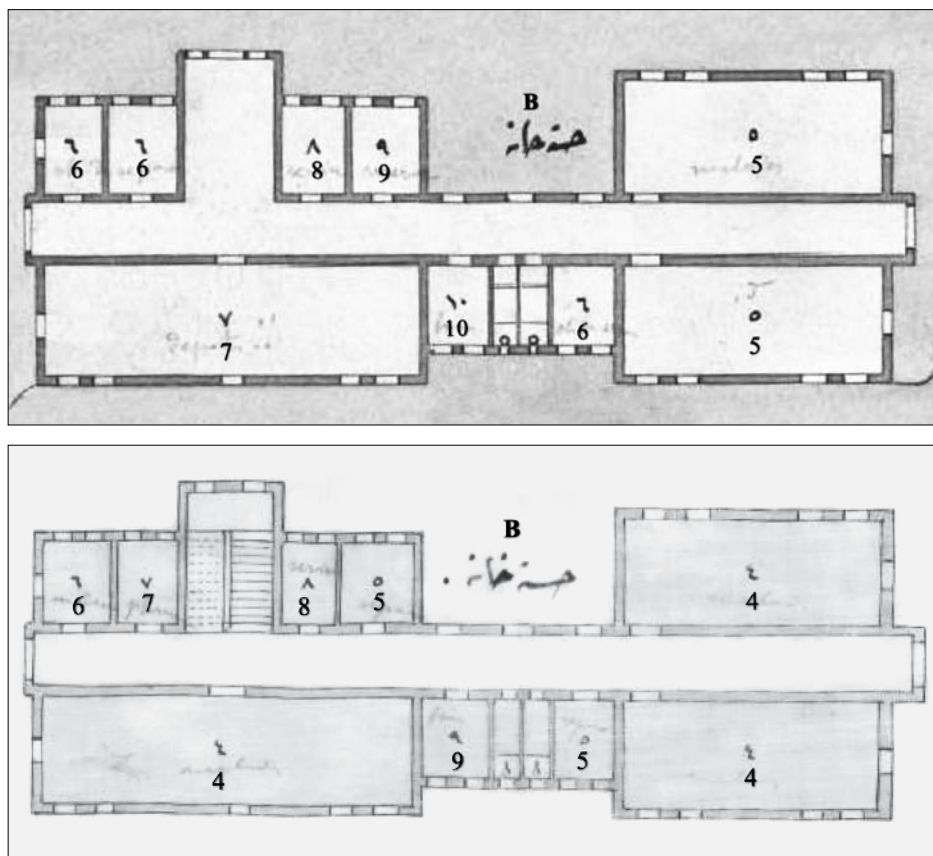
HOSPITAL GROUND FLOOR PLAN: B – HOSPITAL, 5 – HOSPITAL WARD, 6 – SINGLE PATIENT ROOM, 7 – STORAGE, 8 – JANITOR ROOM, 9 – OBSERVATION ROOM, 10 – BATH
